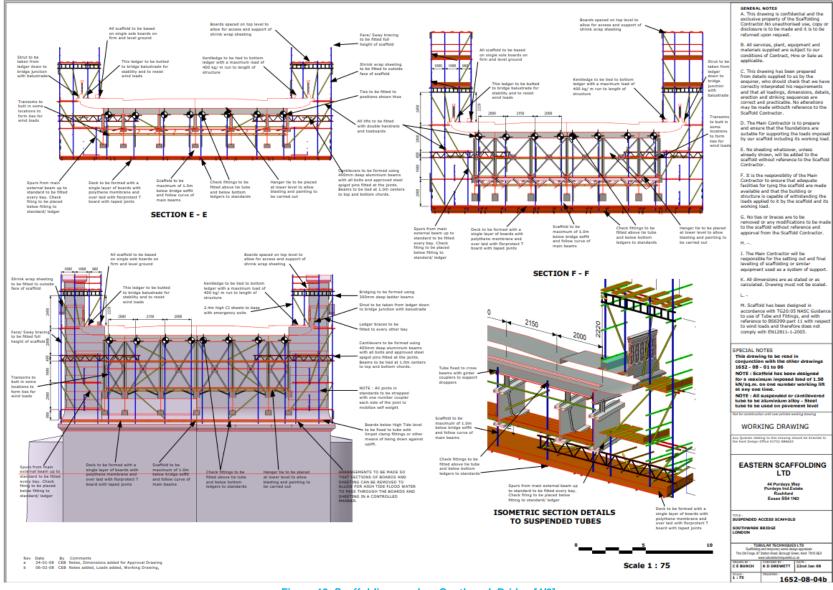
Scaffolding used on Southwark Bridge [4/6]
